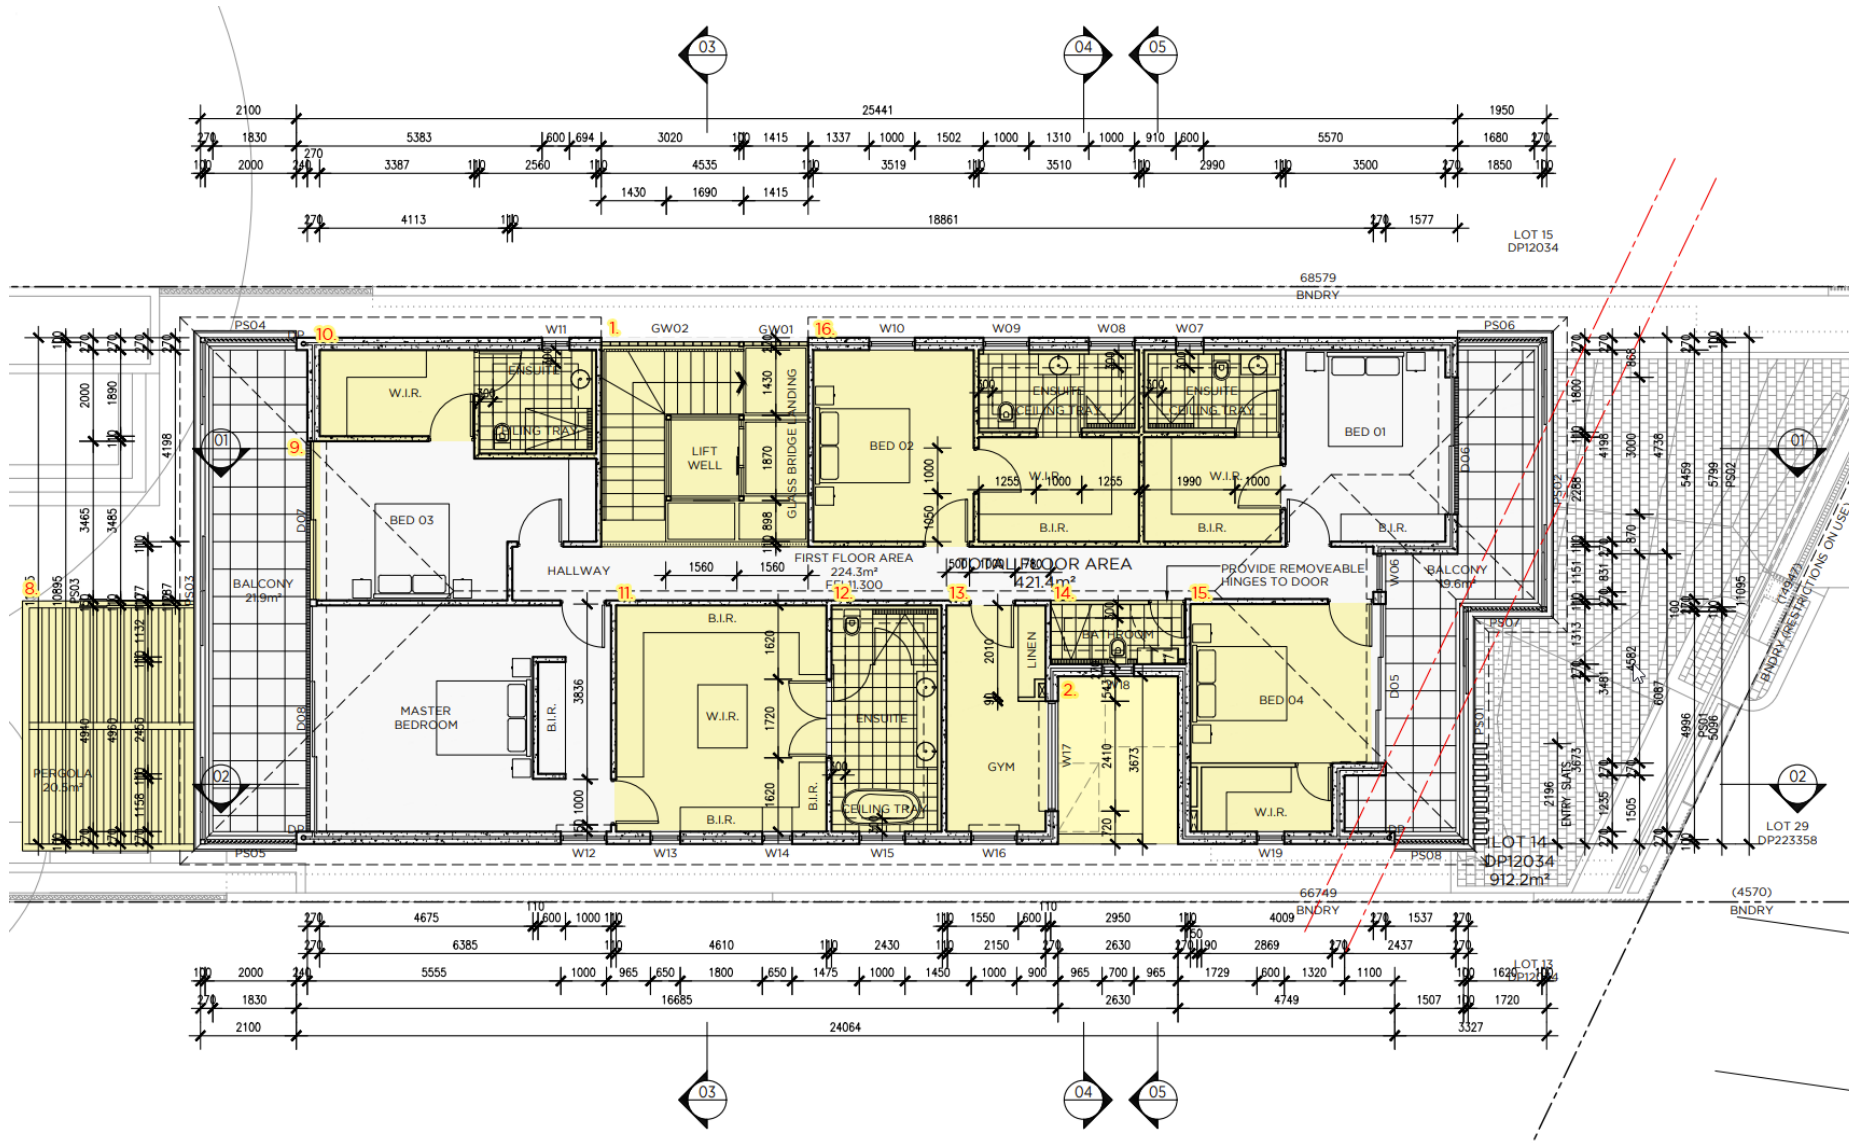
First Floor Plan for S4.55(2) submission prepared by Alvaro Architects.
